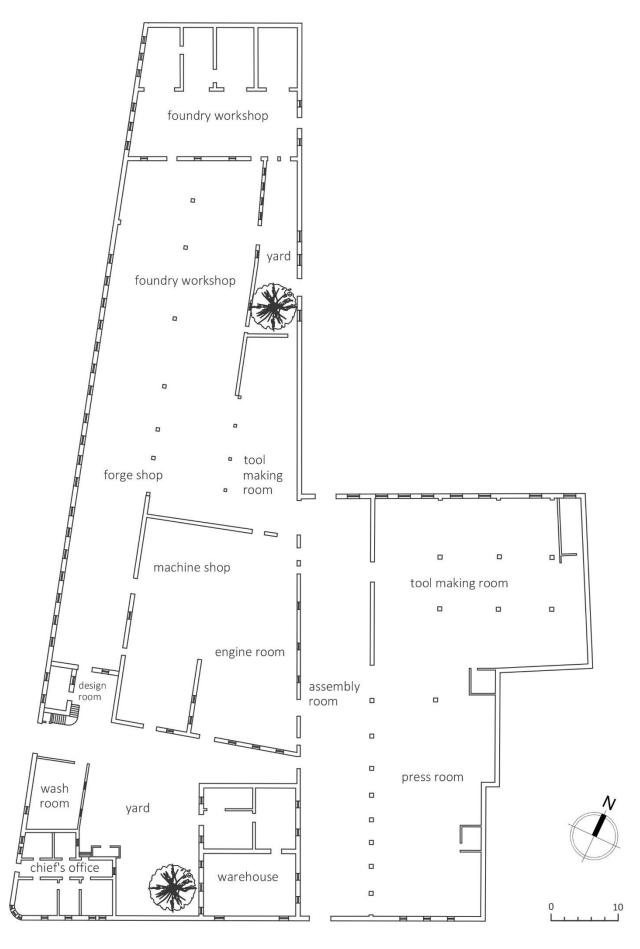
Ground Floor Plan (Phase 3) Source: M. Dimitriou 2019
